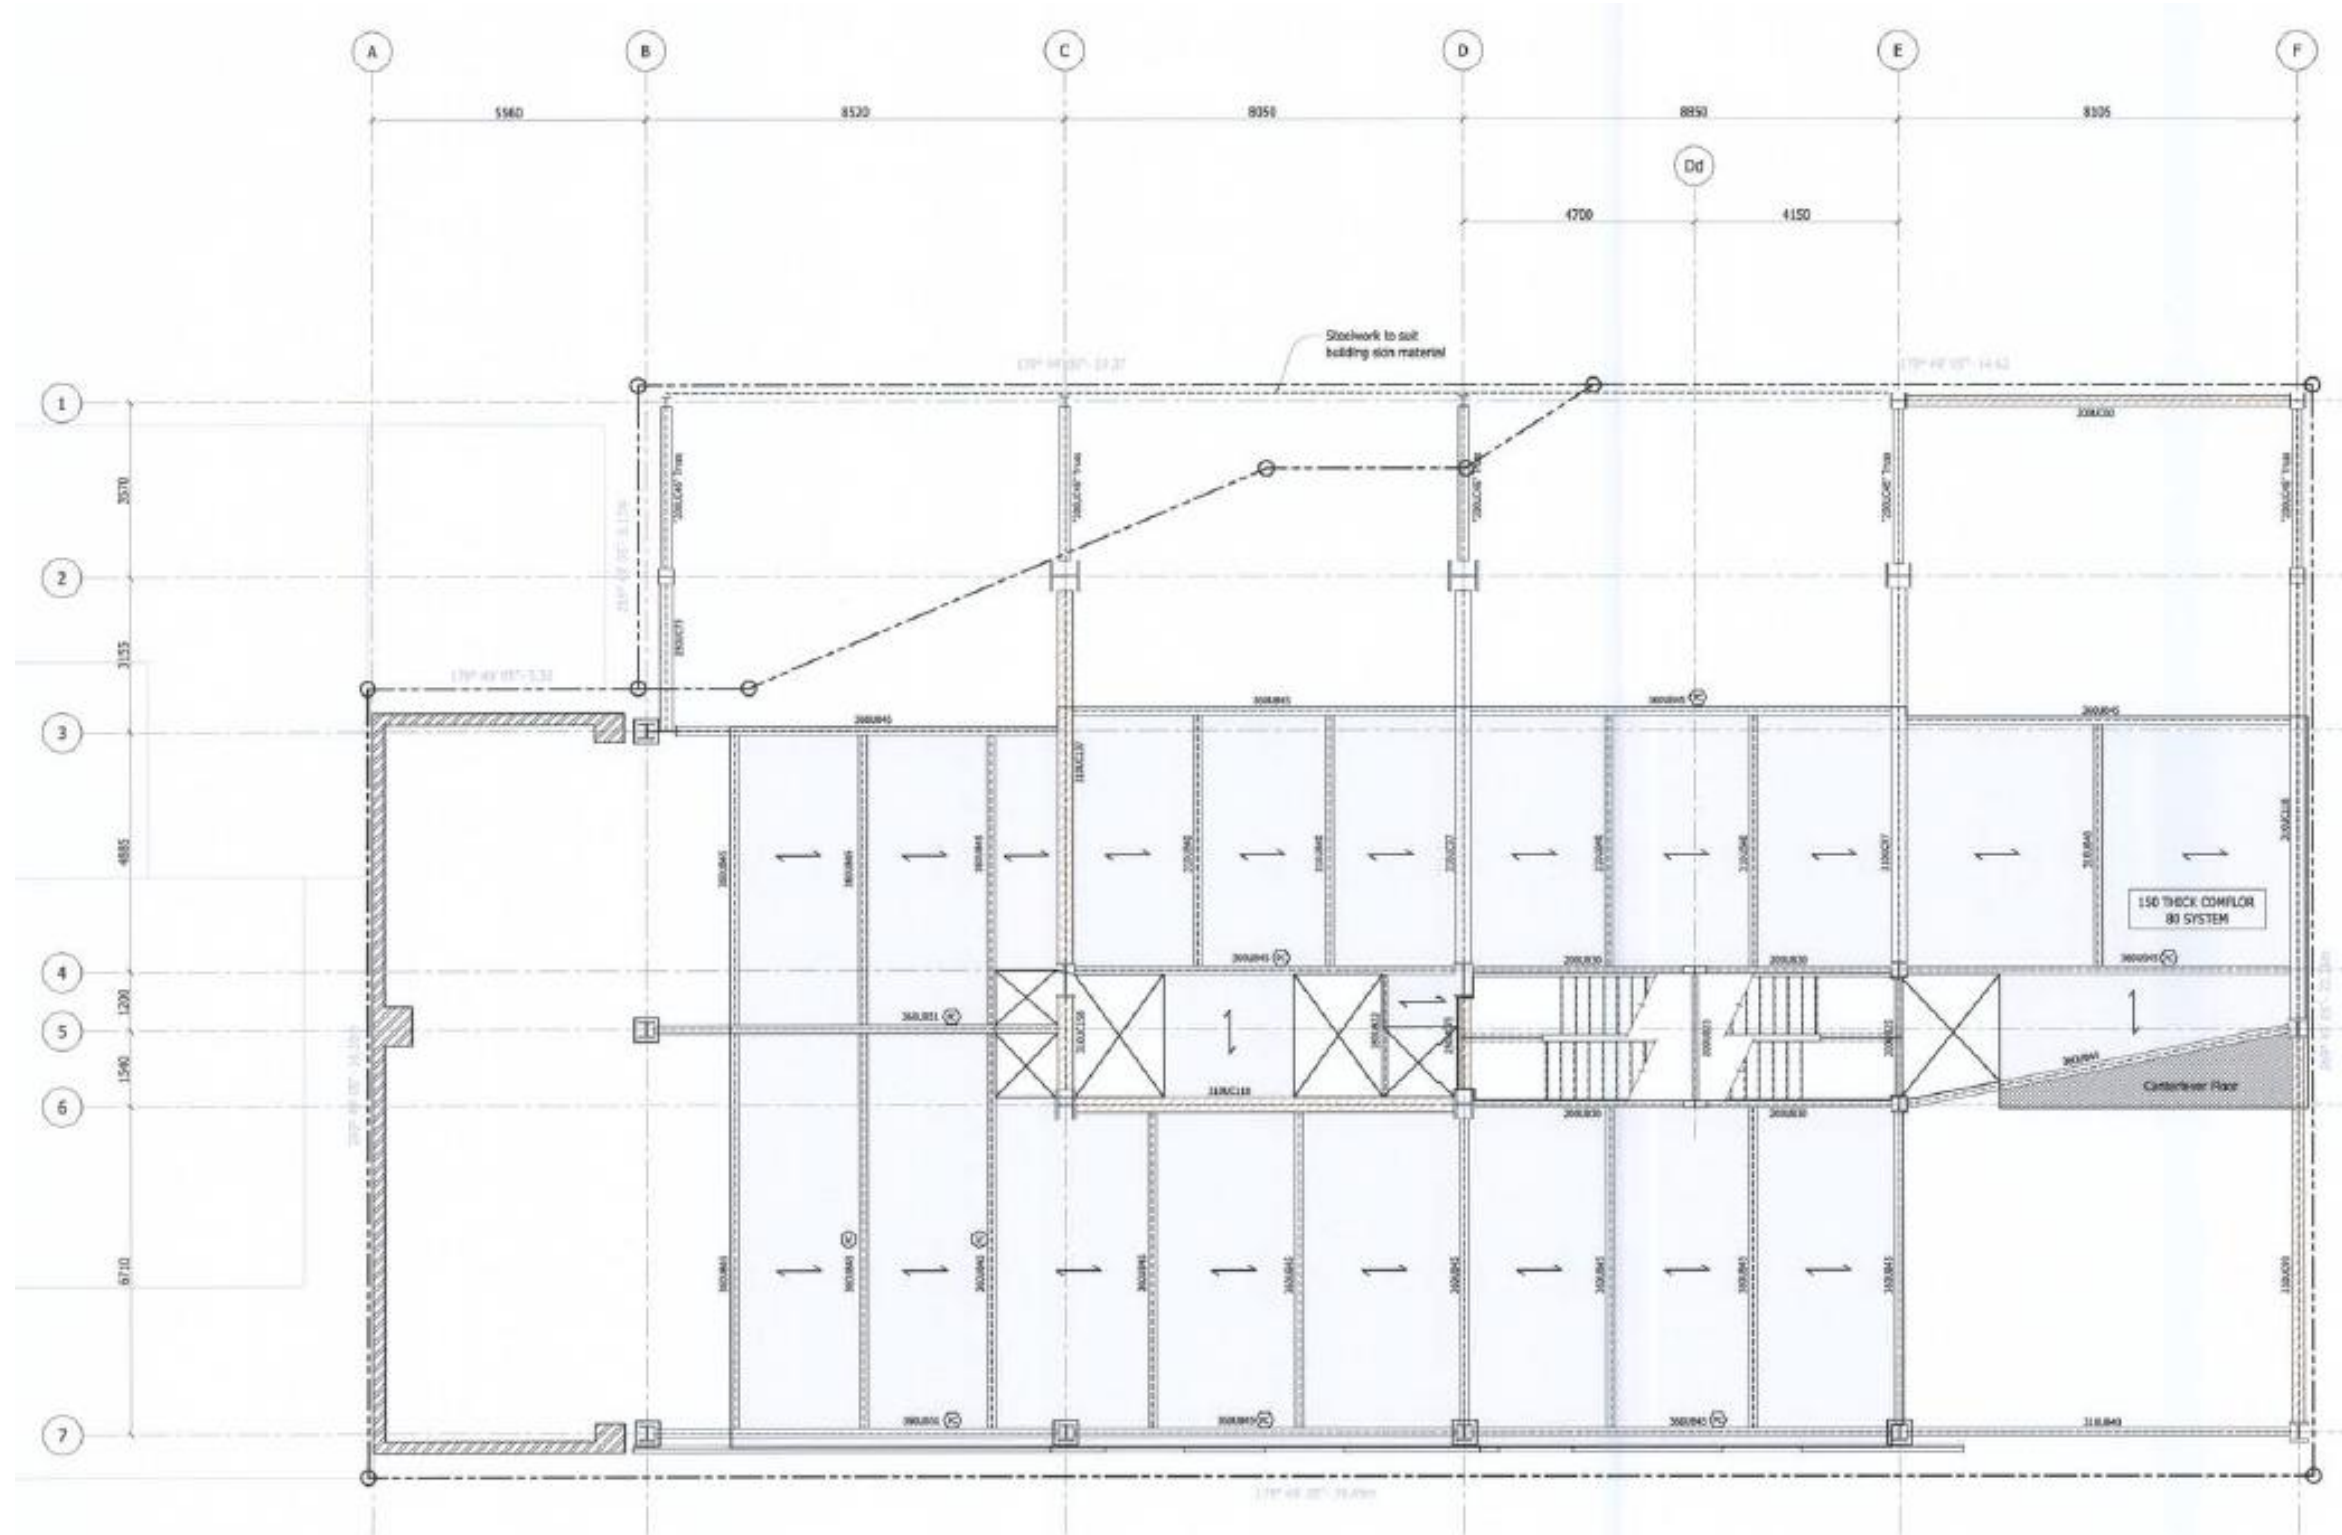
Structural Plan Level 4 (Christchurch City Council 2016c)
